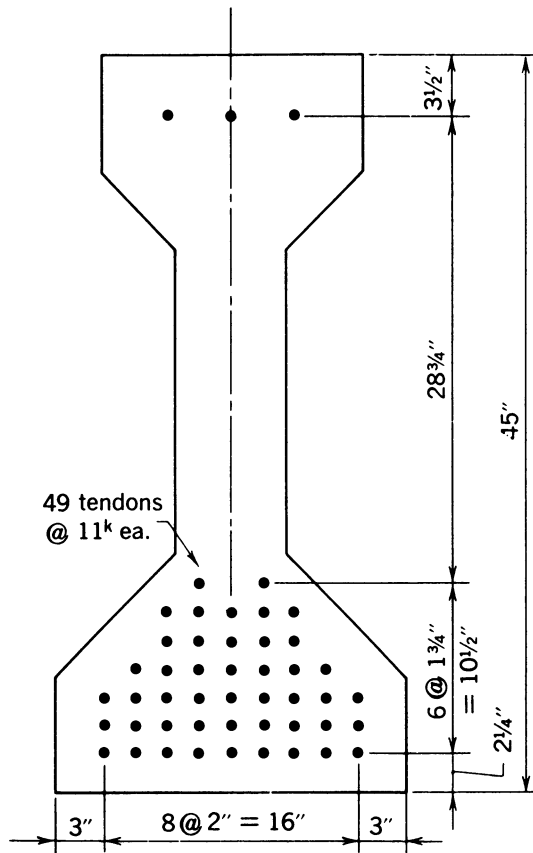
End elevation of pretensioned concrete beam, showing final tendon layout, I.P. 9-14.
